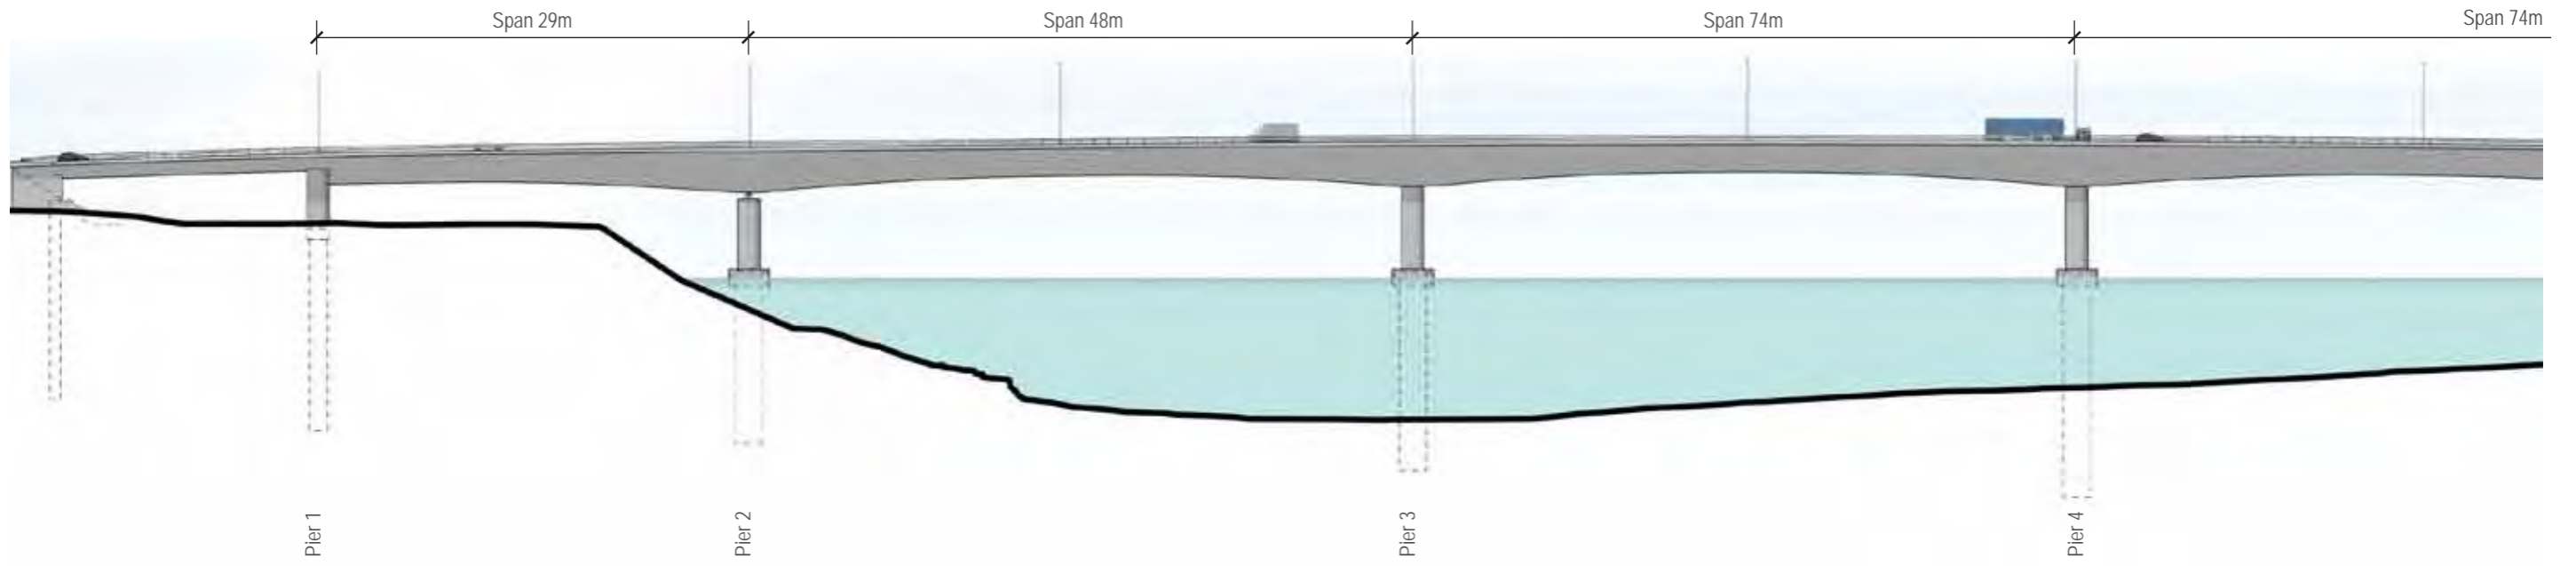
Additional bridge over Clarence River at Grafton - Elevation (Scale 1:750)
